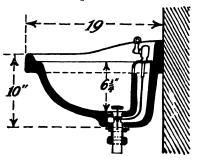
One-piece earthenware lavatory basin with plug waste outlet and lugs for building into wall (Leeds Fireclay Co., Ltd.).
